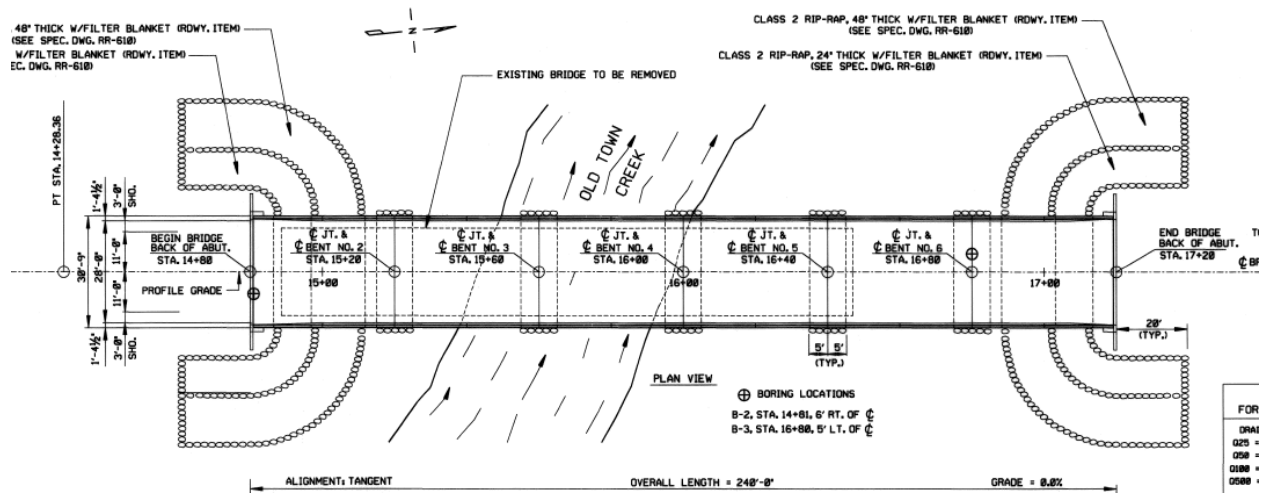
Bridge over Old Town Creek Plan View (ALDOT 2013)
